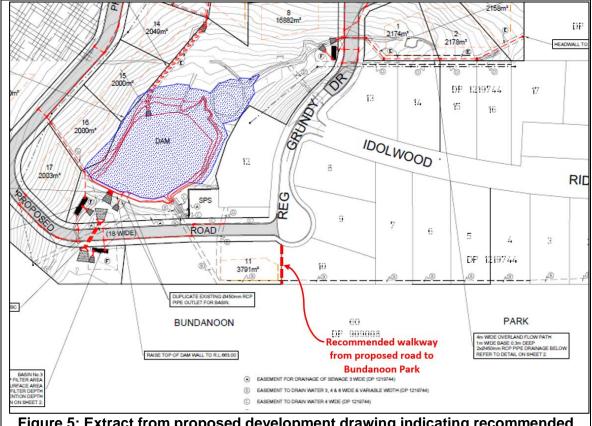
Extract from proposed development drawing indicating recommended walkway.
